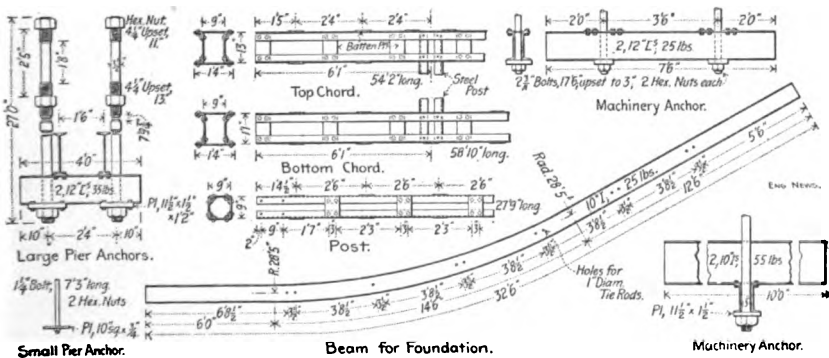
Details of Reinforcement for Clybourn Place Bridge.
